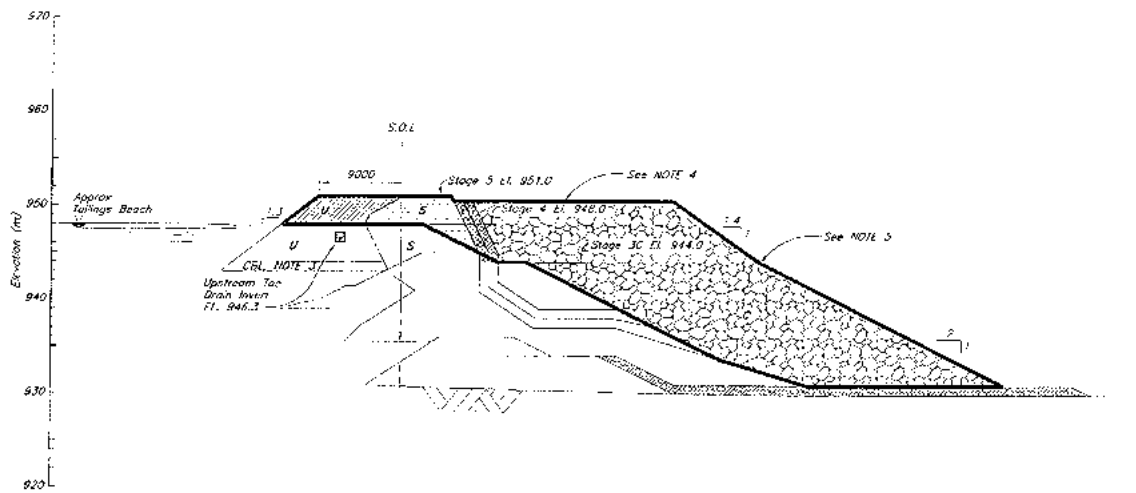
Stage 5 PE Section, As-Built, with Interim Slope
